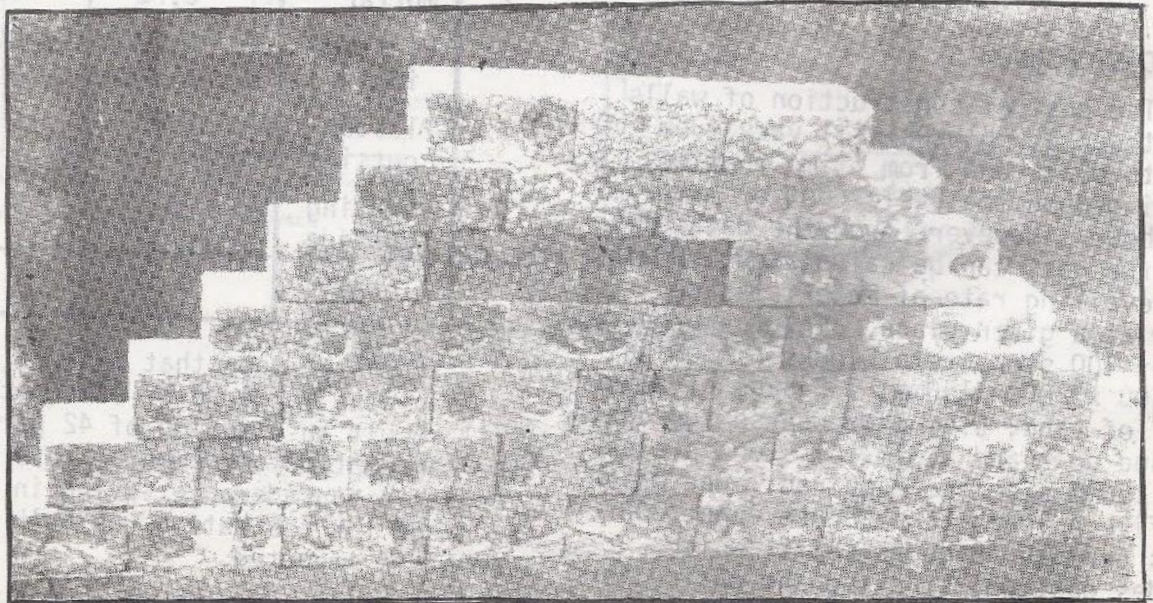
A WALL BUILT WITH STONECRETE BLOCKS.
